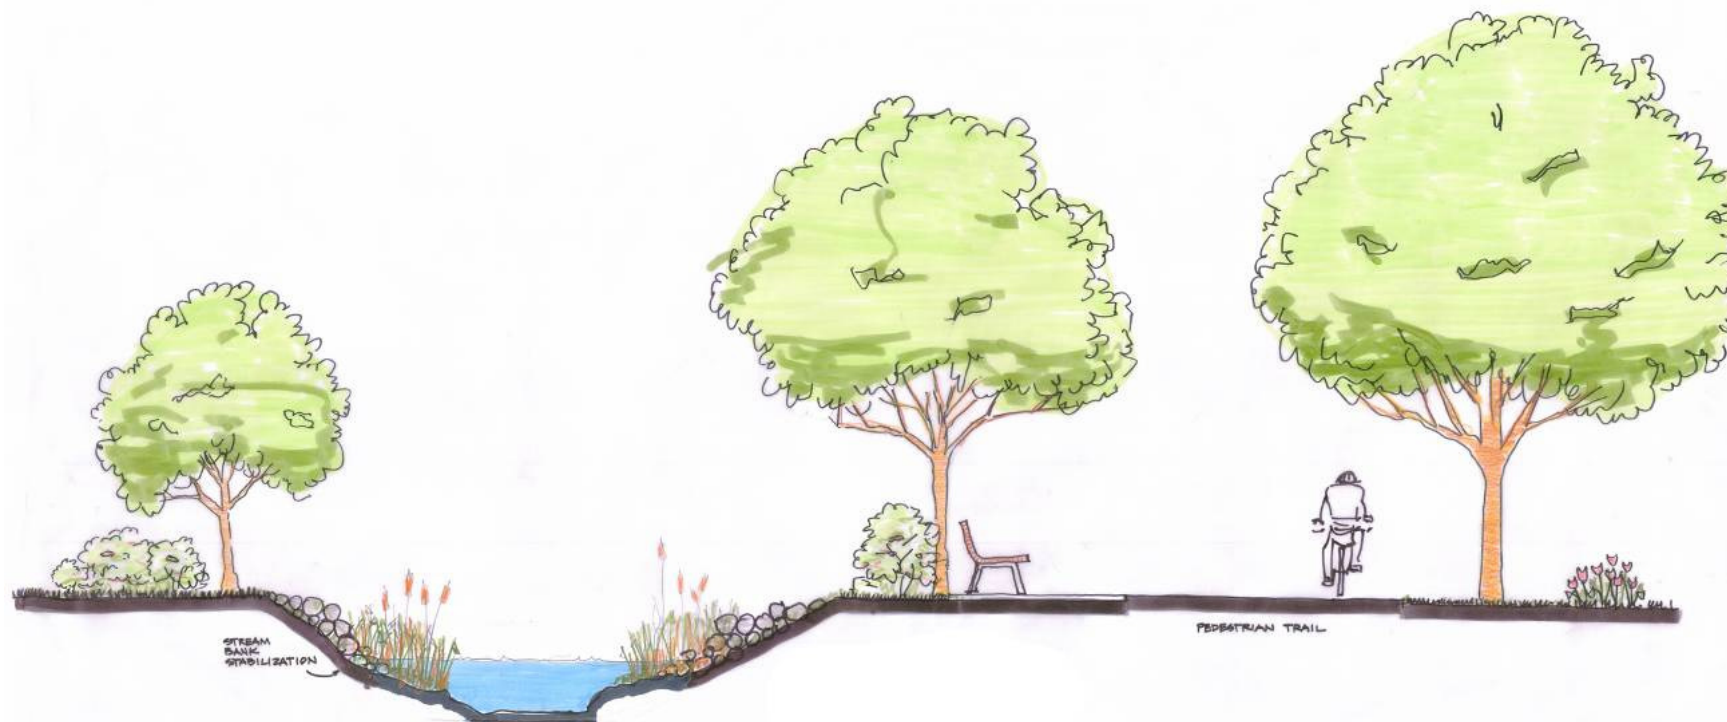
Dry Run Creek Trail Section. An example of what some portions of Dry Run Creek could look like by incorporating channel improvements, stream bank stabilization, native vegetation, and pedestrian trails.
